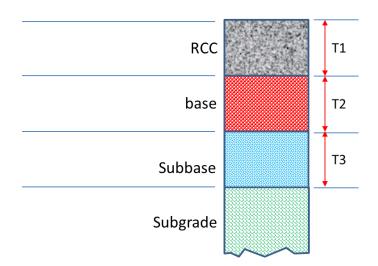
Proposed rigid pavement layers (subbase is required for heavy traffic road only).
